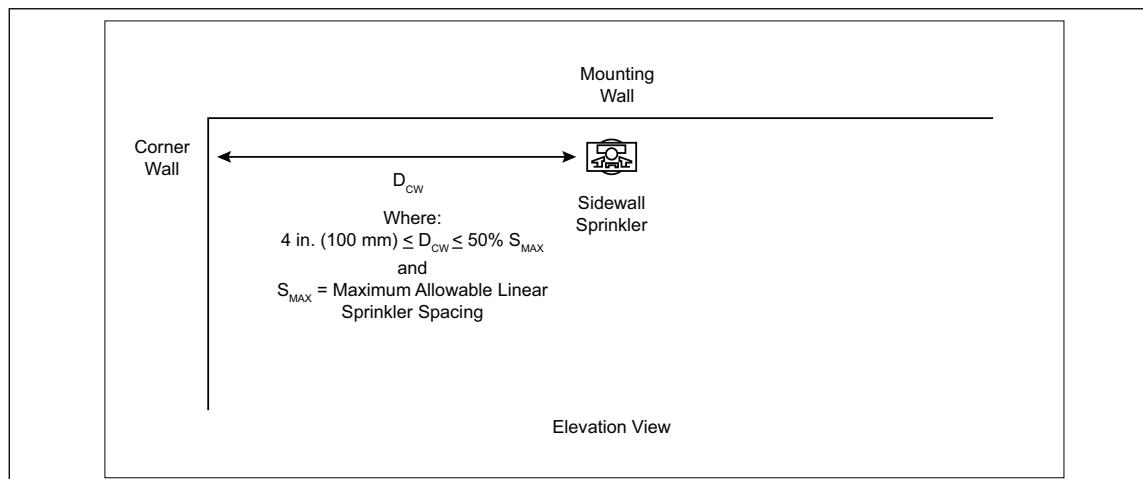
(b). Horizontal distances from Nonstorage sidewall sprinklers to wall corners
